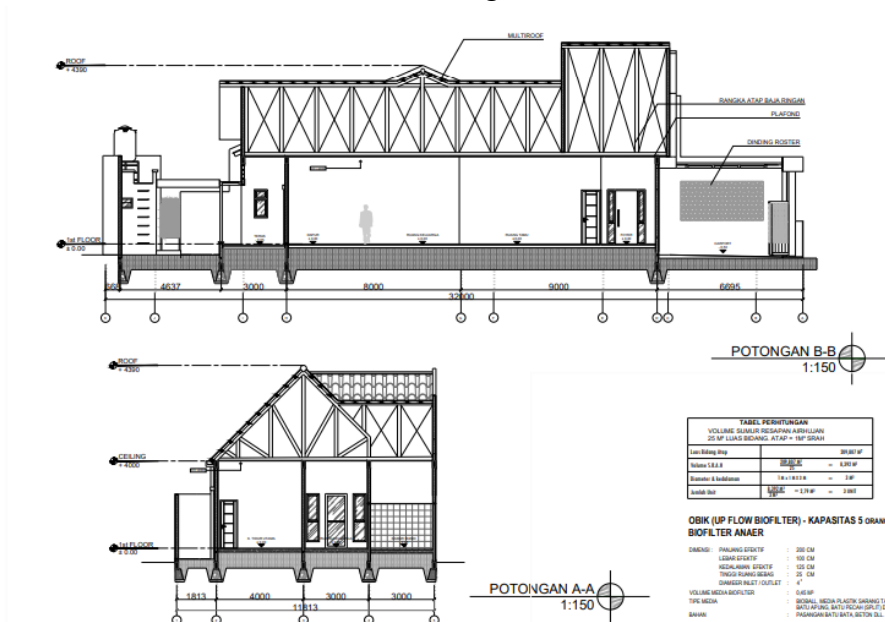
Picture of Visible Pieces of Light Steel Roof Truss
